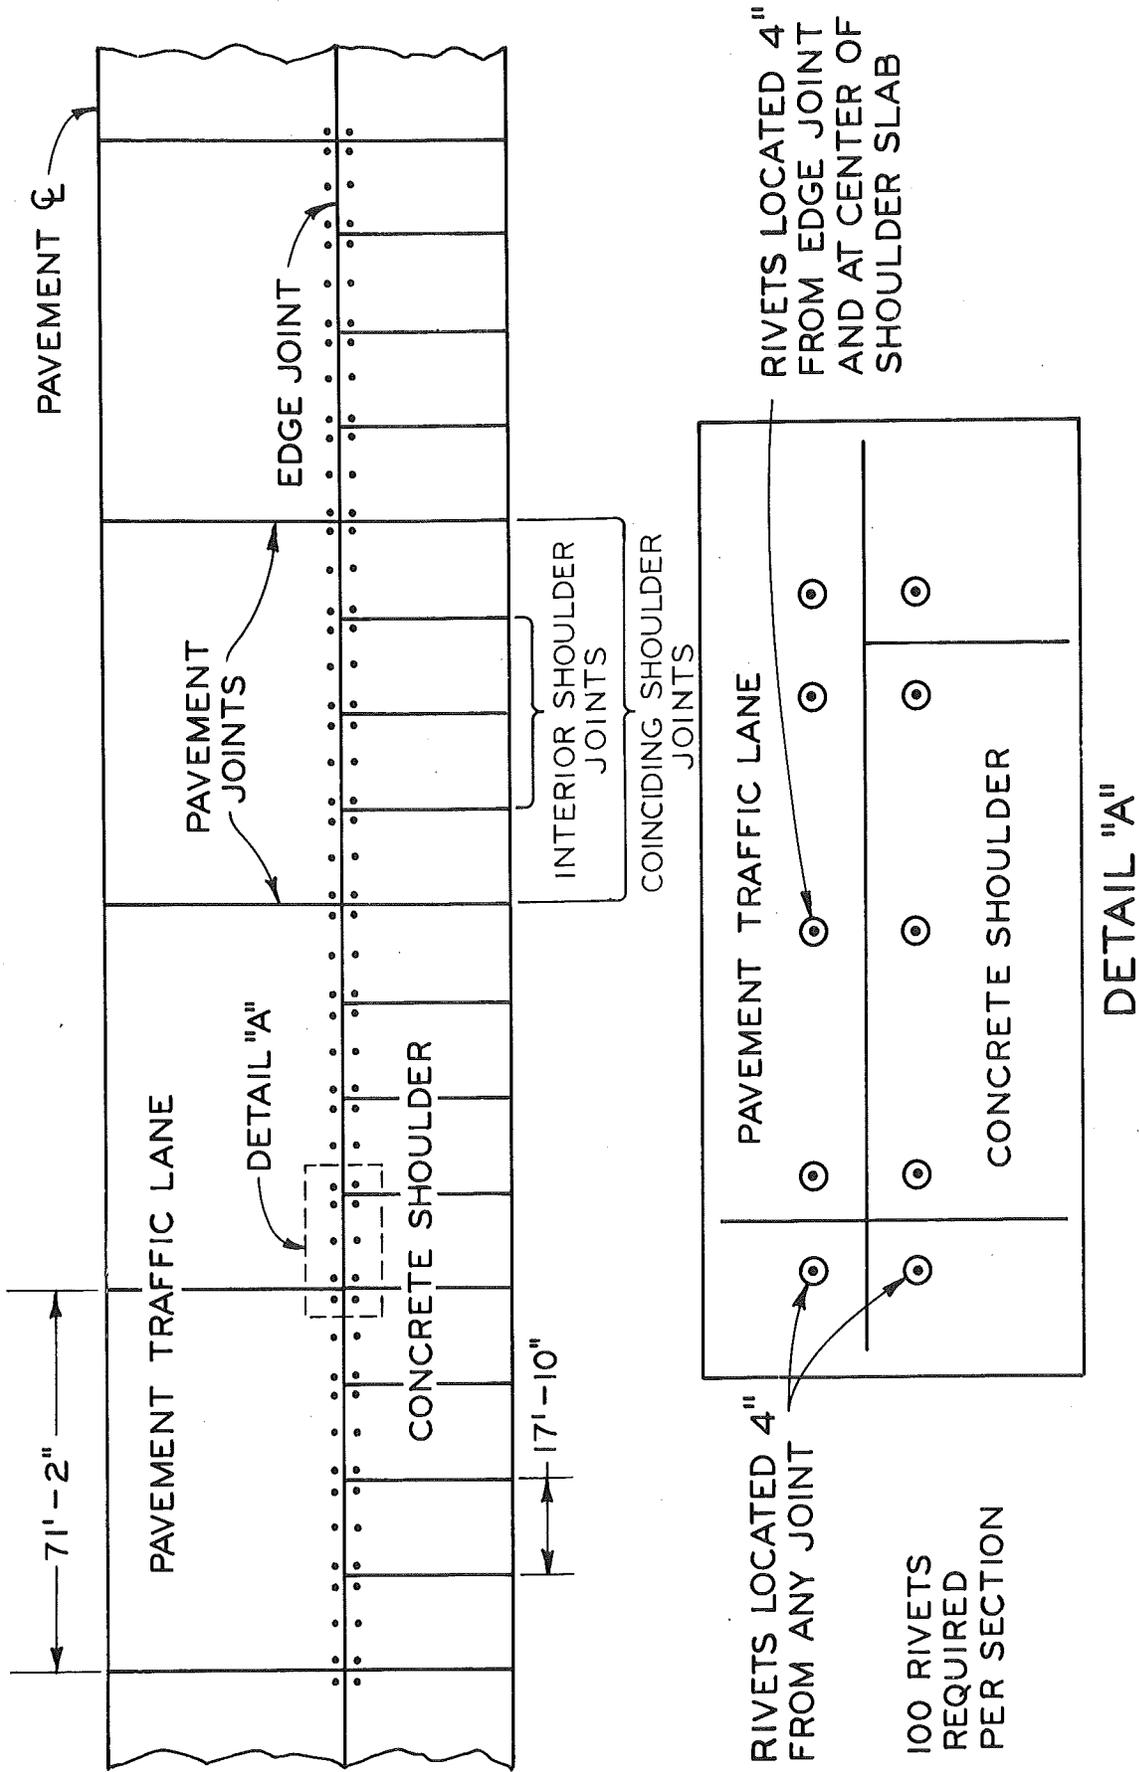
Rivet locations for instrumented sections of concrete shoulder project. One section of 16 shoulder slabs was instrumented as shown in each of 3 half mile test sections.
